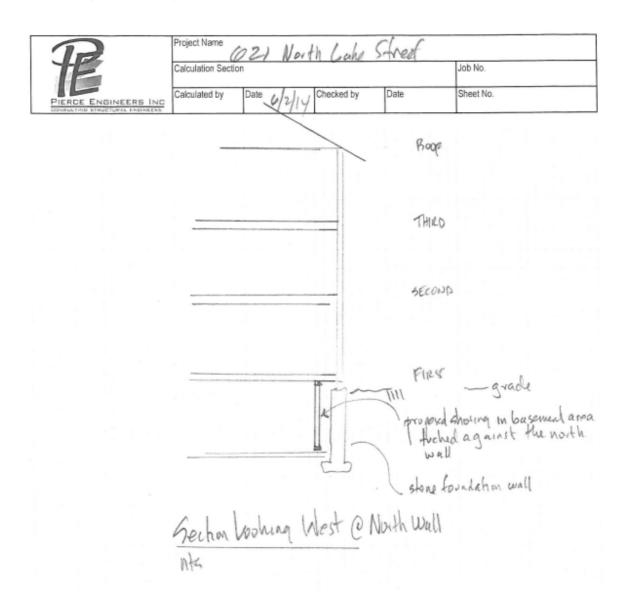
Findorff Shoring Wall Proposal & Engineer Diagrams
